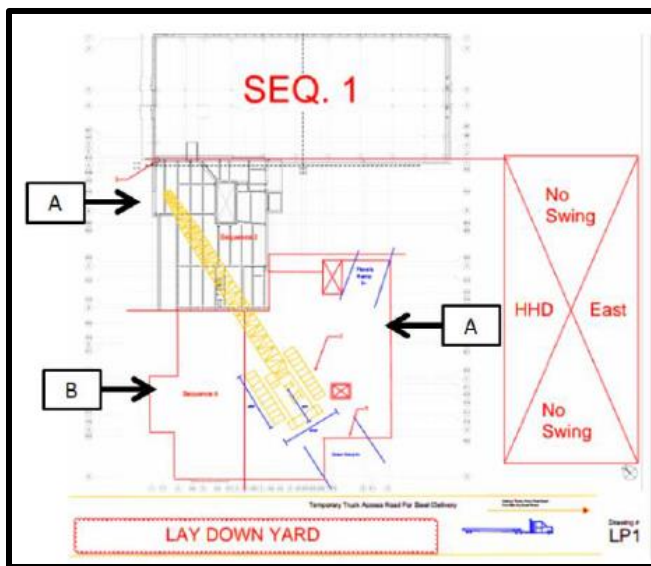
Steel Sequencing Plan Courtesy of RNR Construction
